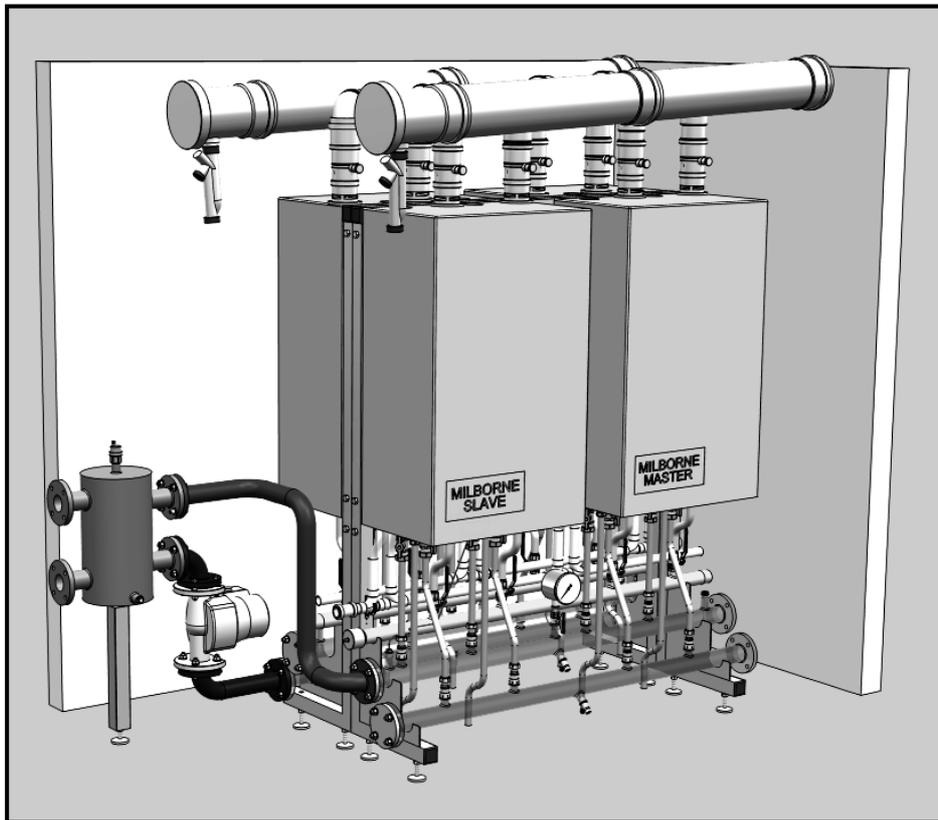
Two boiler back to back arrangement showing frame, flue headers, water pipework and primary circuit pump kit
